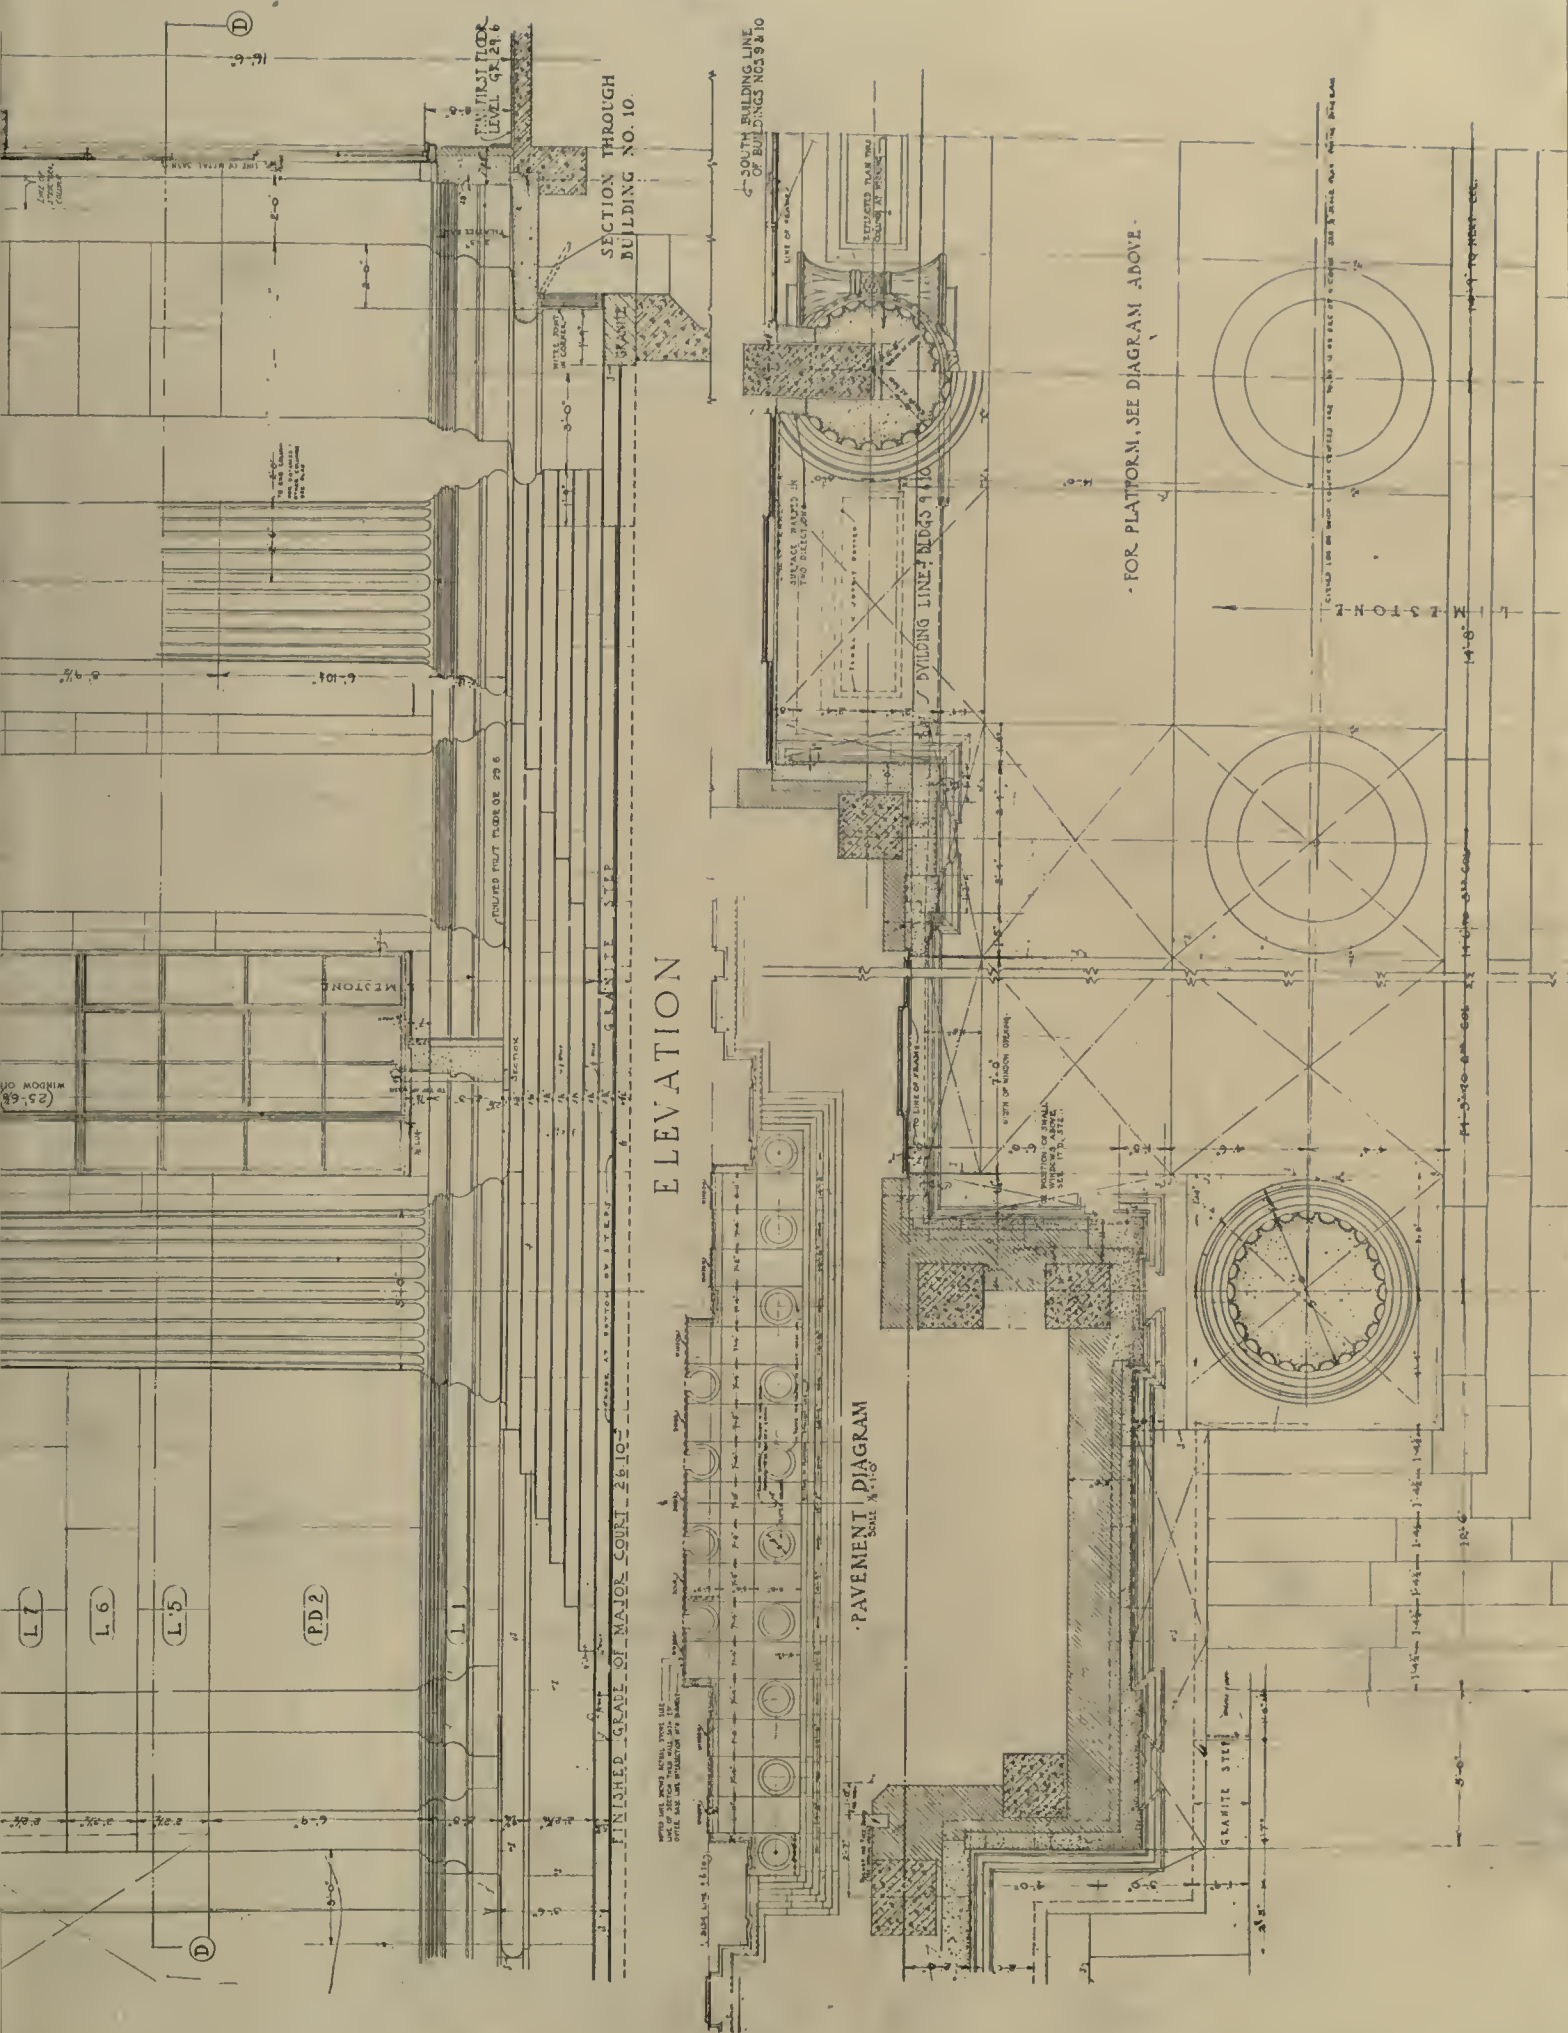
DETAIL OF CORNER PAVILION, WEST SIDE OF COURT
